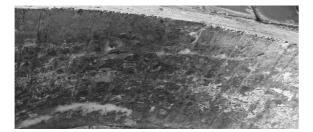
Corrosion of steel bar in higher edge of cap beam
